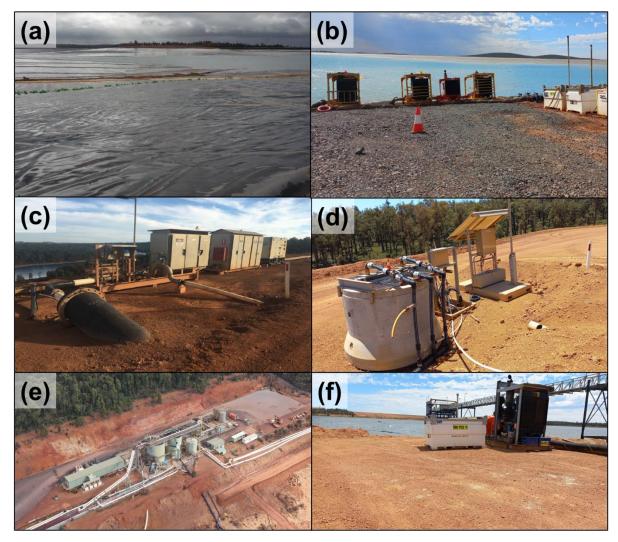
F1 RDA – (a) HDPE liner overlooking the tailings beach and decant pond; (b) decant pump setup; (c) sump collected seepage from underdrainage system and associated pumps; (d) toe drain sump and pump; (e) booster pump station and cyanide destruction plant; (f) R4 RDA decant pump setup.
